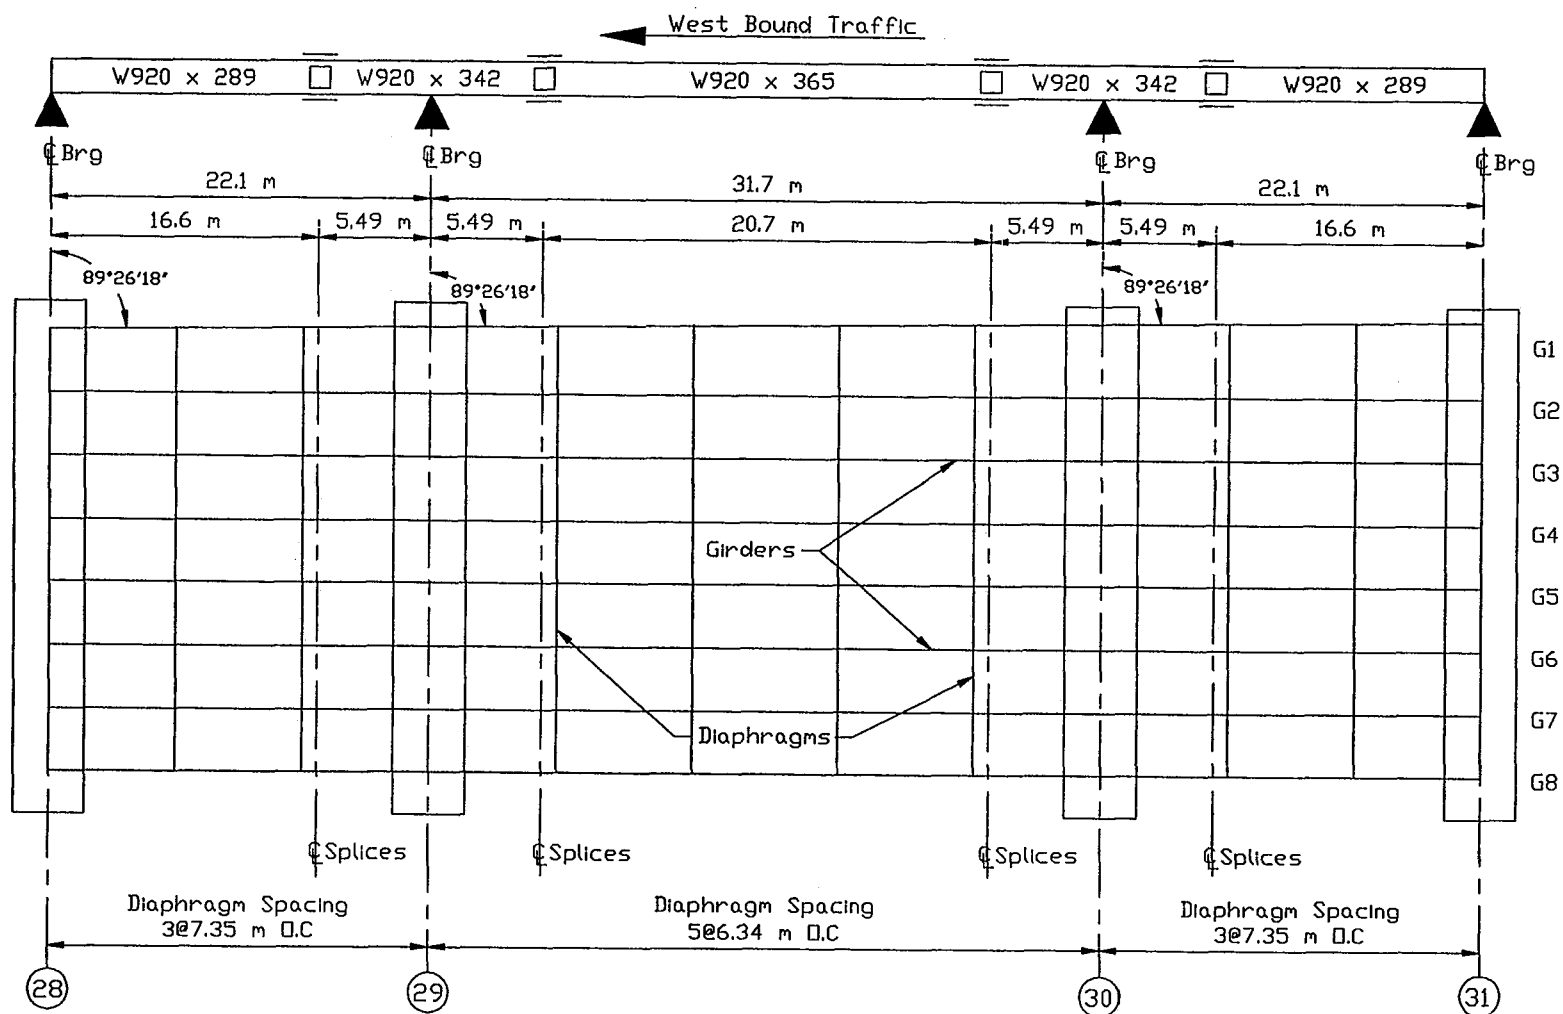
Plan View and Girder Details for the 76 m 3-Span Continuous Bridge with Original Diaphragms In-Place
